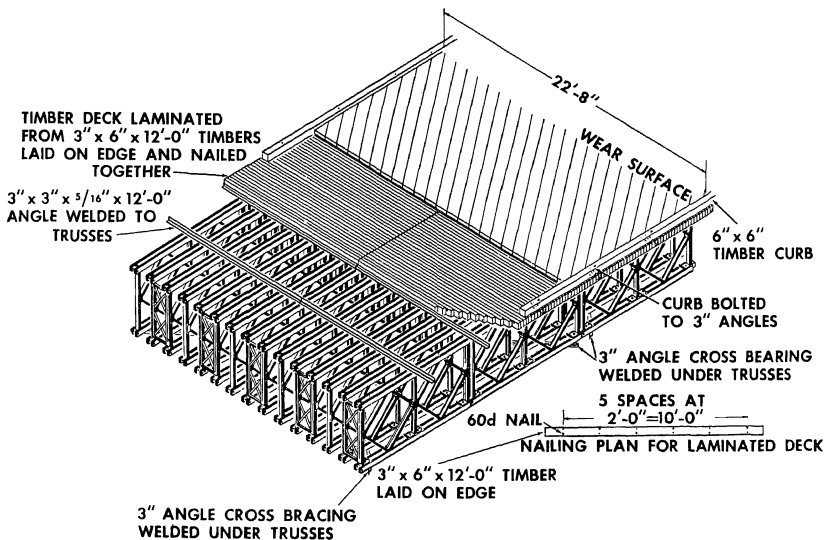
Details of laminated timber deck on a two-lane deck type panel bridge.
